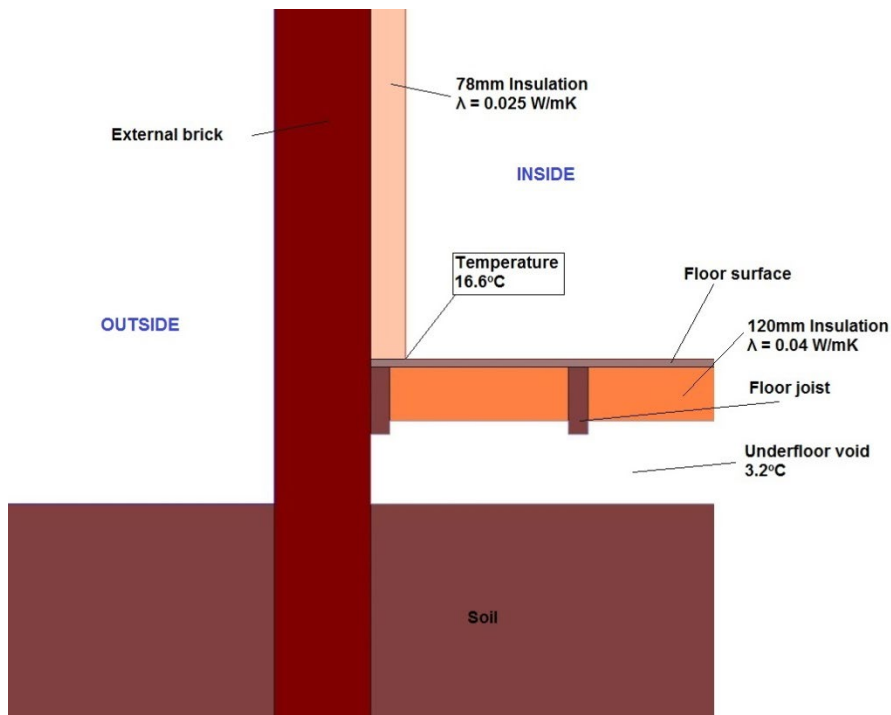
Junction between an insulated suspended ground floor (typology R1) and a wall with internal insulation (typology R8) with no junction insulation
